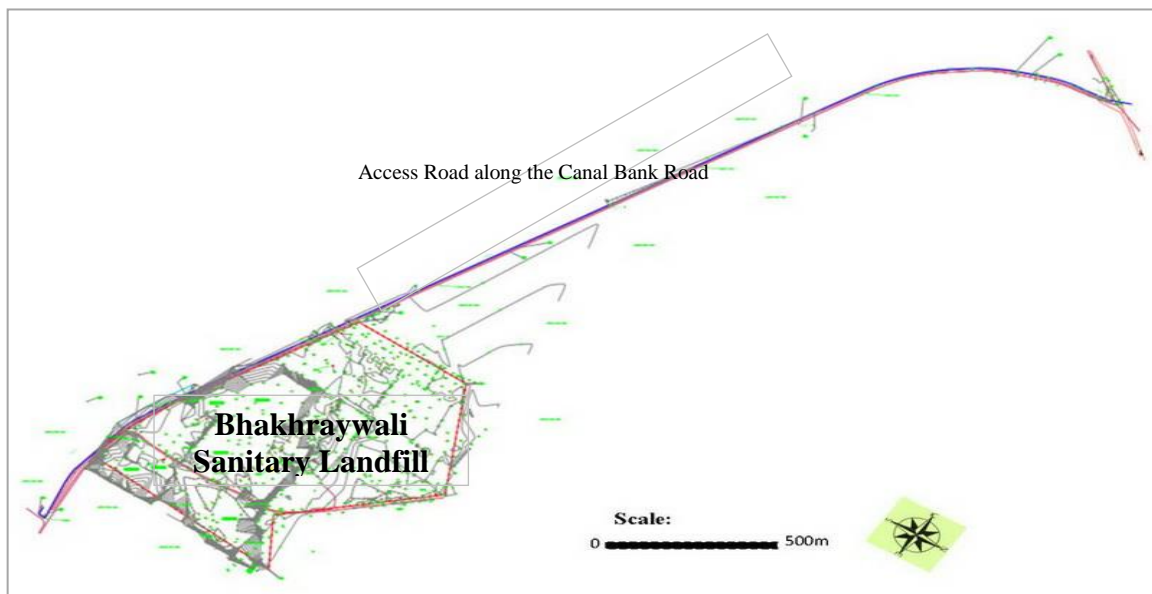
Access Road of Bhakhraywali Sanitary Landfill Facility
